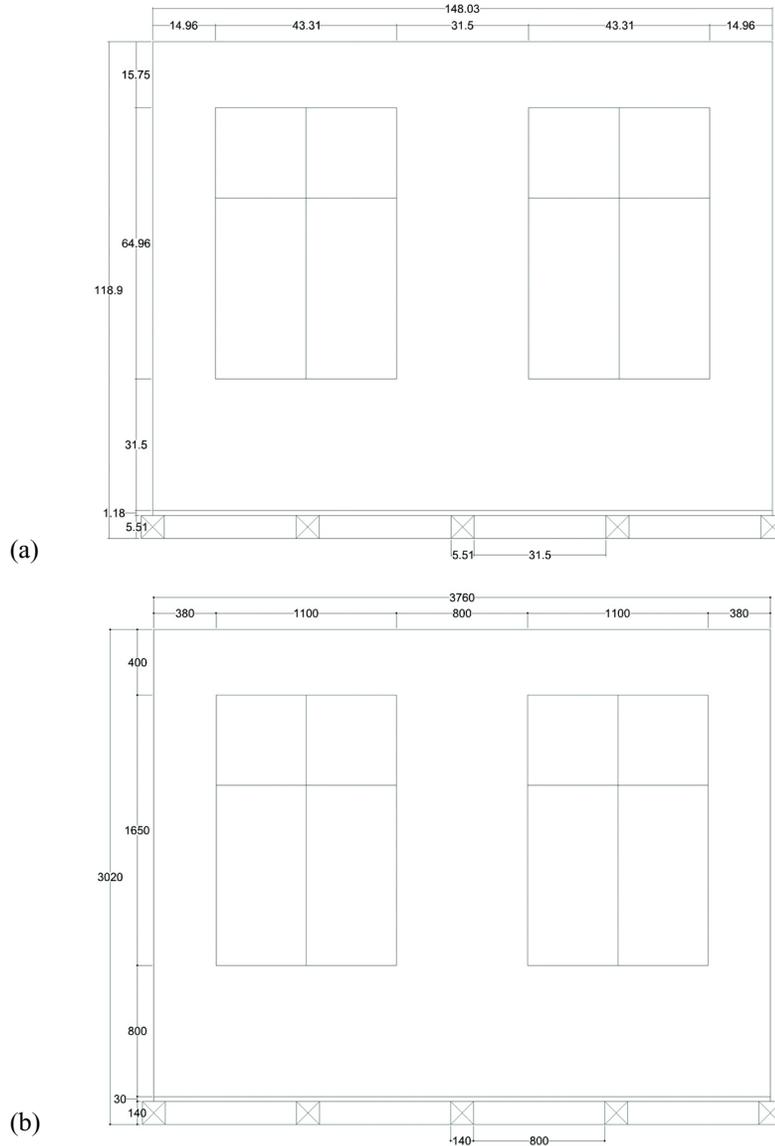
Section of a typical outer wall with wooden floor beams from 1850–1950 in (a) I-P units and (b) SI units.
